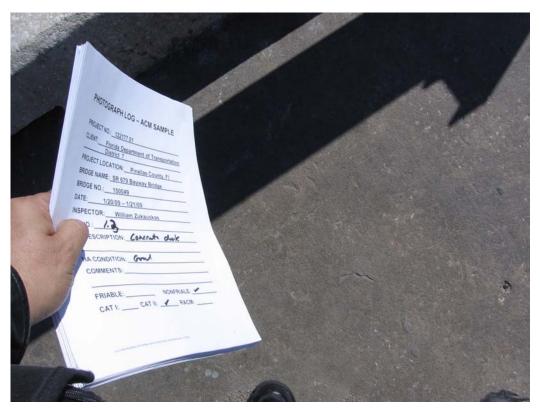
01/21/09 – SAMPLE 1.3 – HA 1 CONCRETE BRIDGE DECK AND COLUMNS
